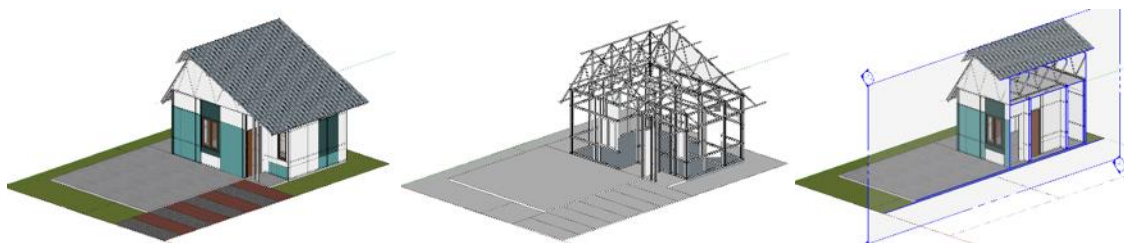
Rigid and compact spatial layout, makes it possible to avoid damage to short storeys.
